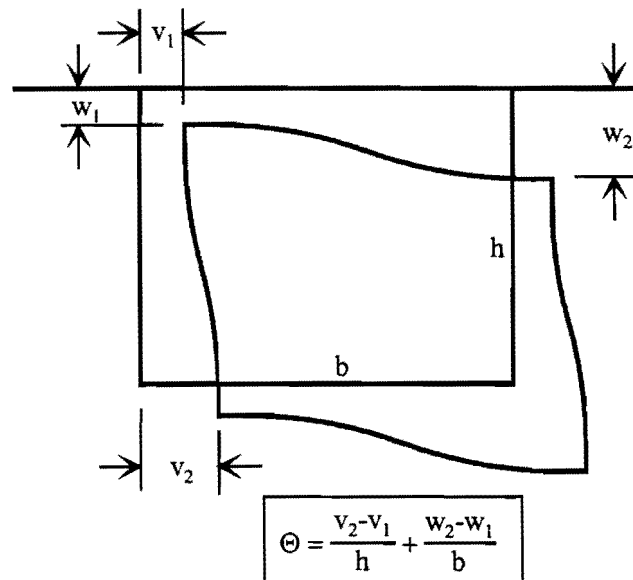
Angular Deformation of Box Girder Under Distortion
